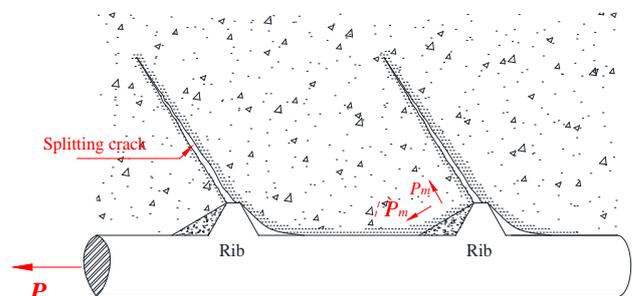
Mechanical interaction between concrete and deformed steel bar
